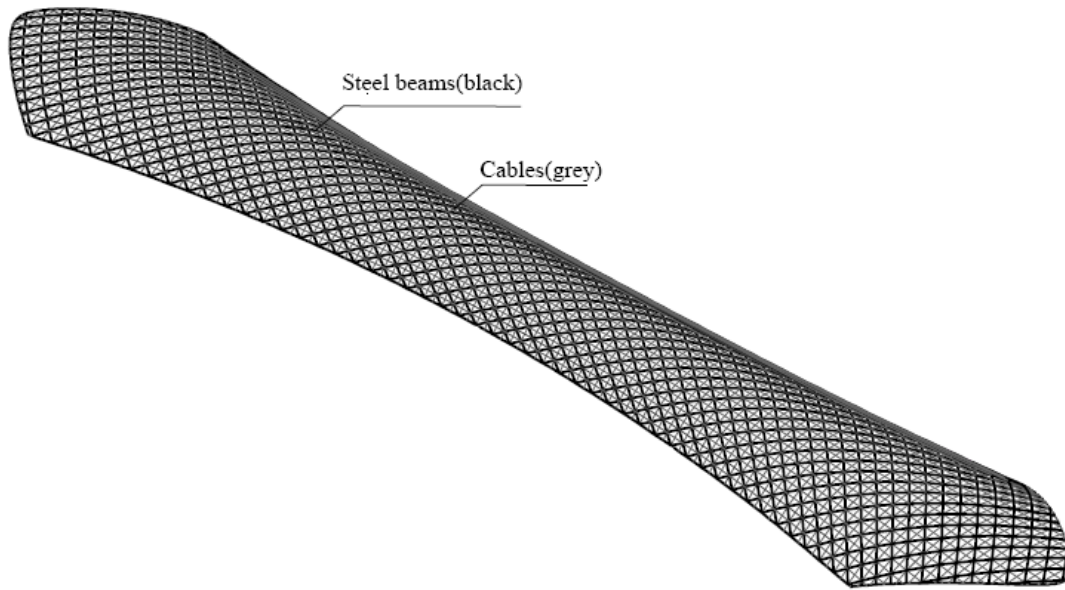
The Glass Roof of New Guangzhou Railway Station in China
